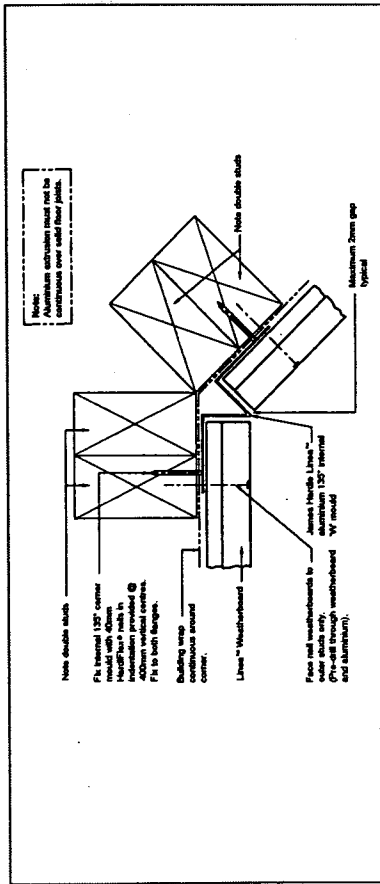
DIRECT FIX INTERNAL 135° ALUMINIUM 'W' MOULD CORNER
